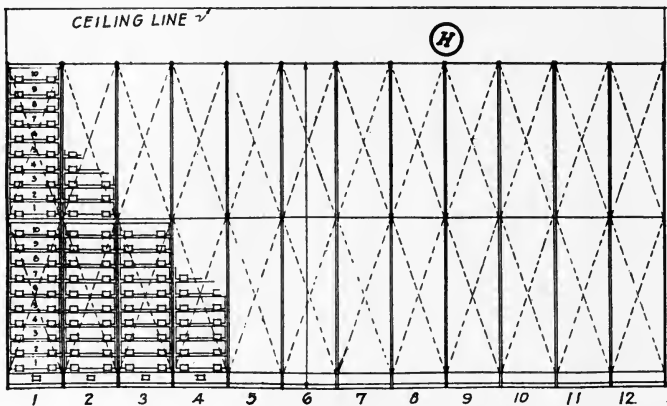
Typical front elevation to storage cabinets, showing two-section stacks and doors to individual compartments: (H) space reserved for horizontal flue to exterior.
